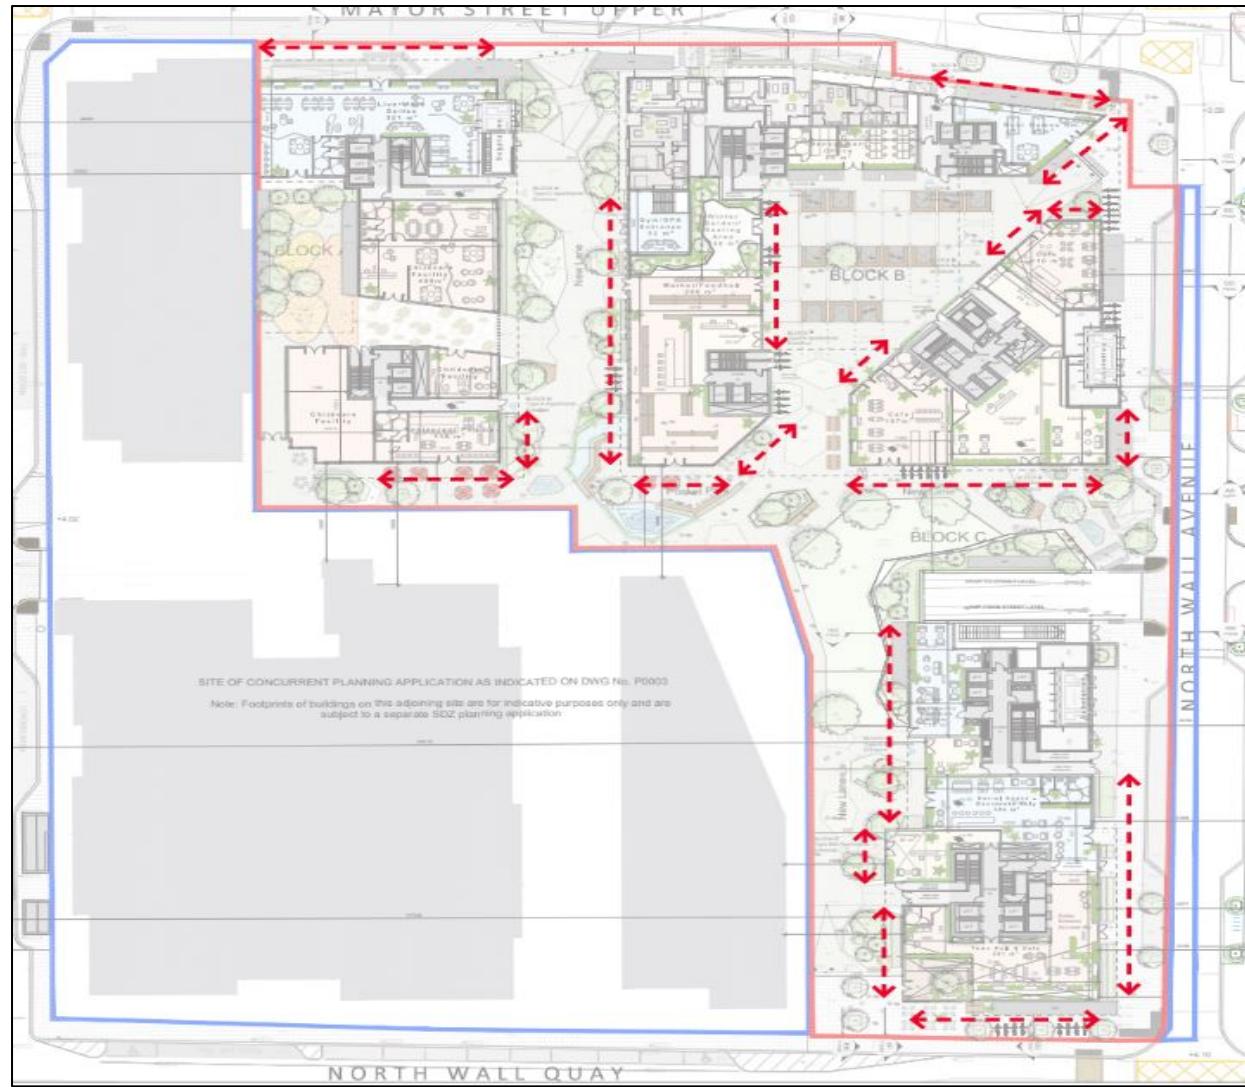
Indicative ground floor plan showing active frontages. Source: Section 4.7 of the Design Statement prepared by HJL, January 2021. Cropped by TPA, January 2021.
